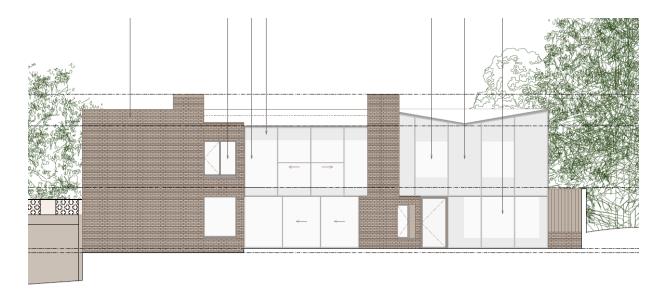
Extract of proposed western Elevation (ref: 207_GA_140_A)
